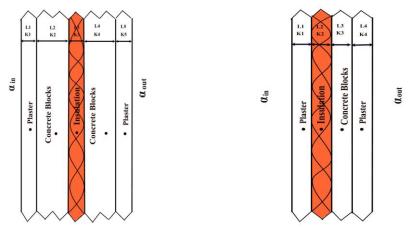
A wall with Insulation Using Concrete Blocks Material Construction.
